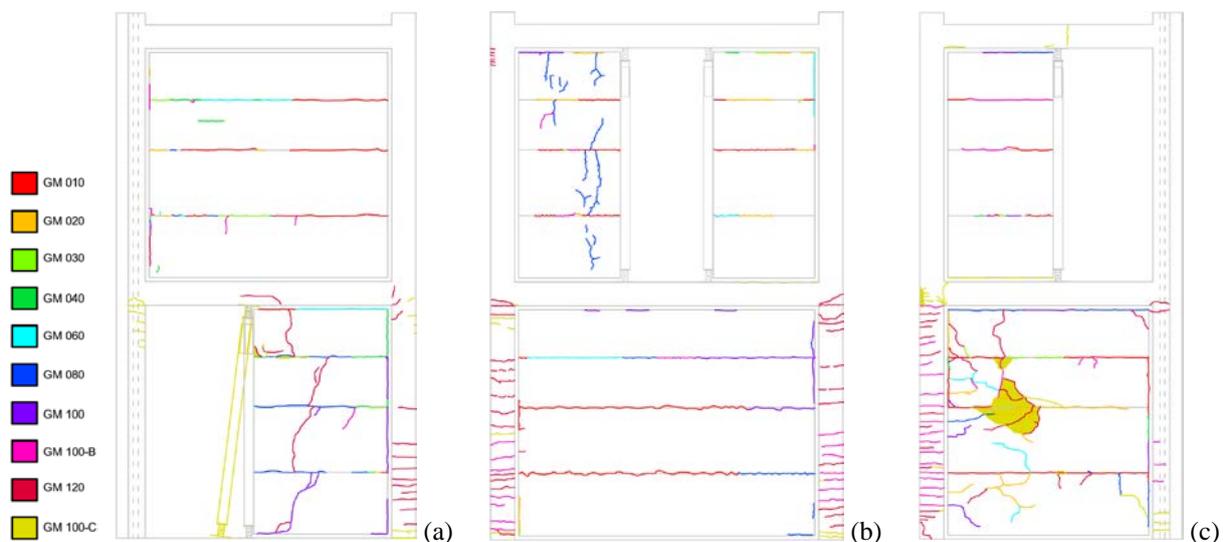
Cracking pattern of outer side of the E (a), N (b) and S-E (c) façades of the model.
